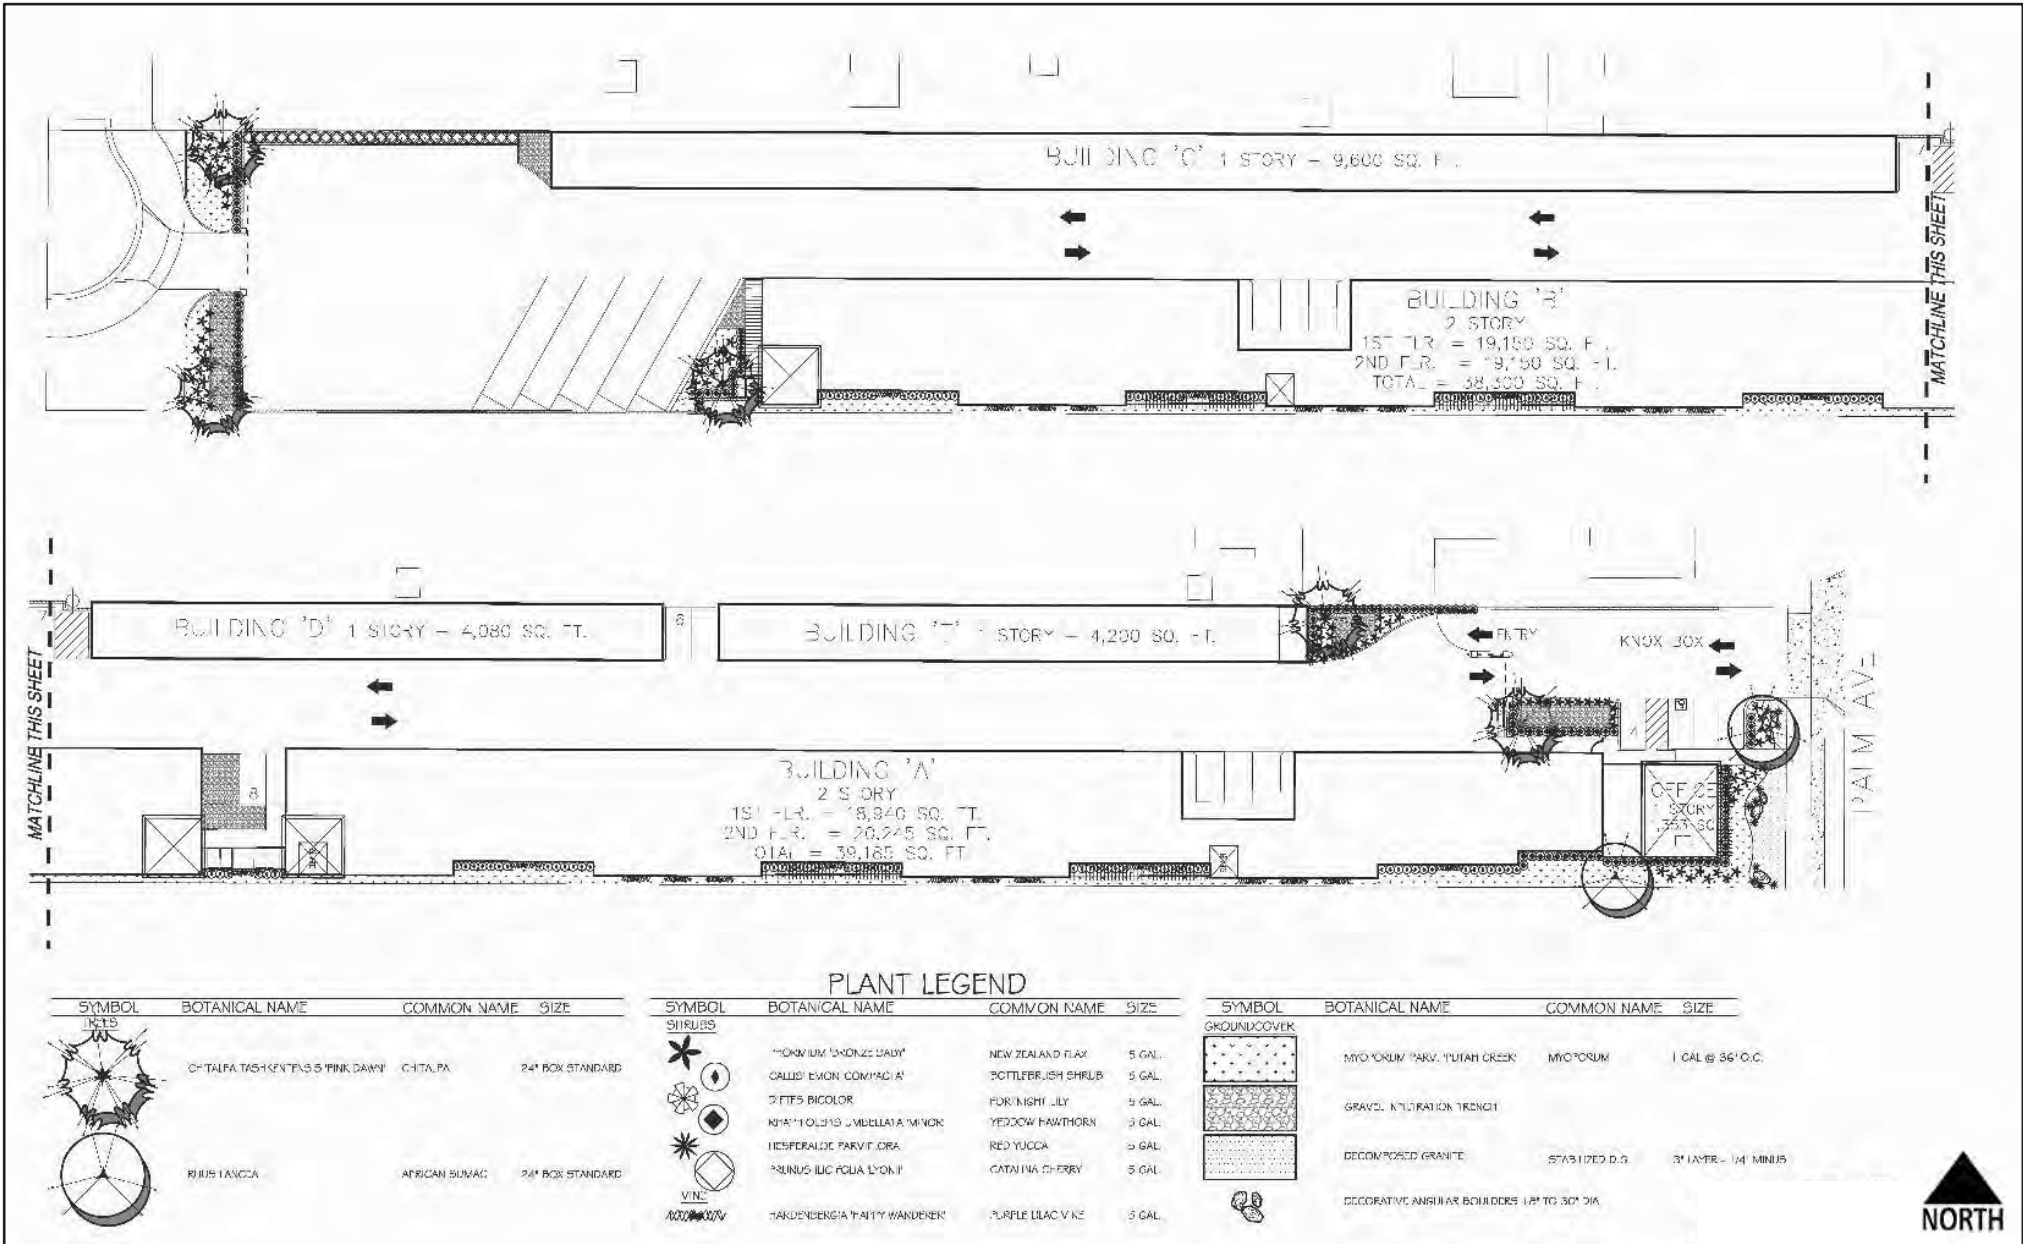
Project Plans (Conceptual Landscape Plan)
